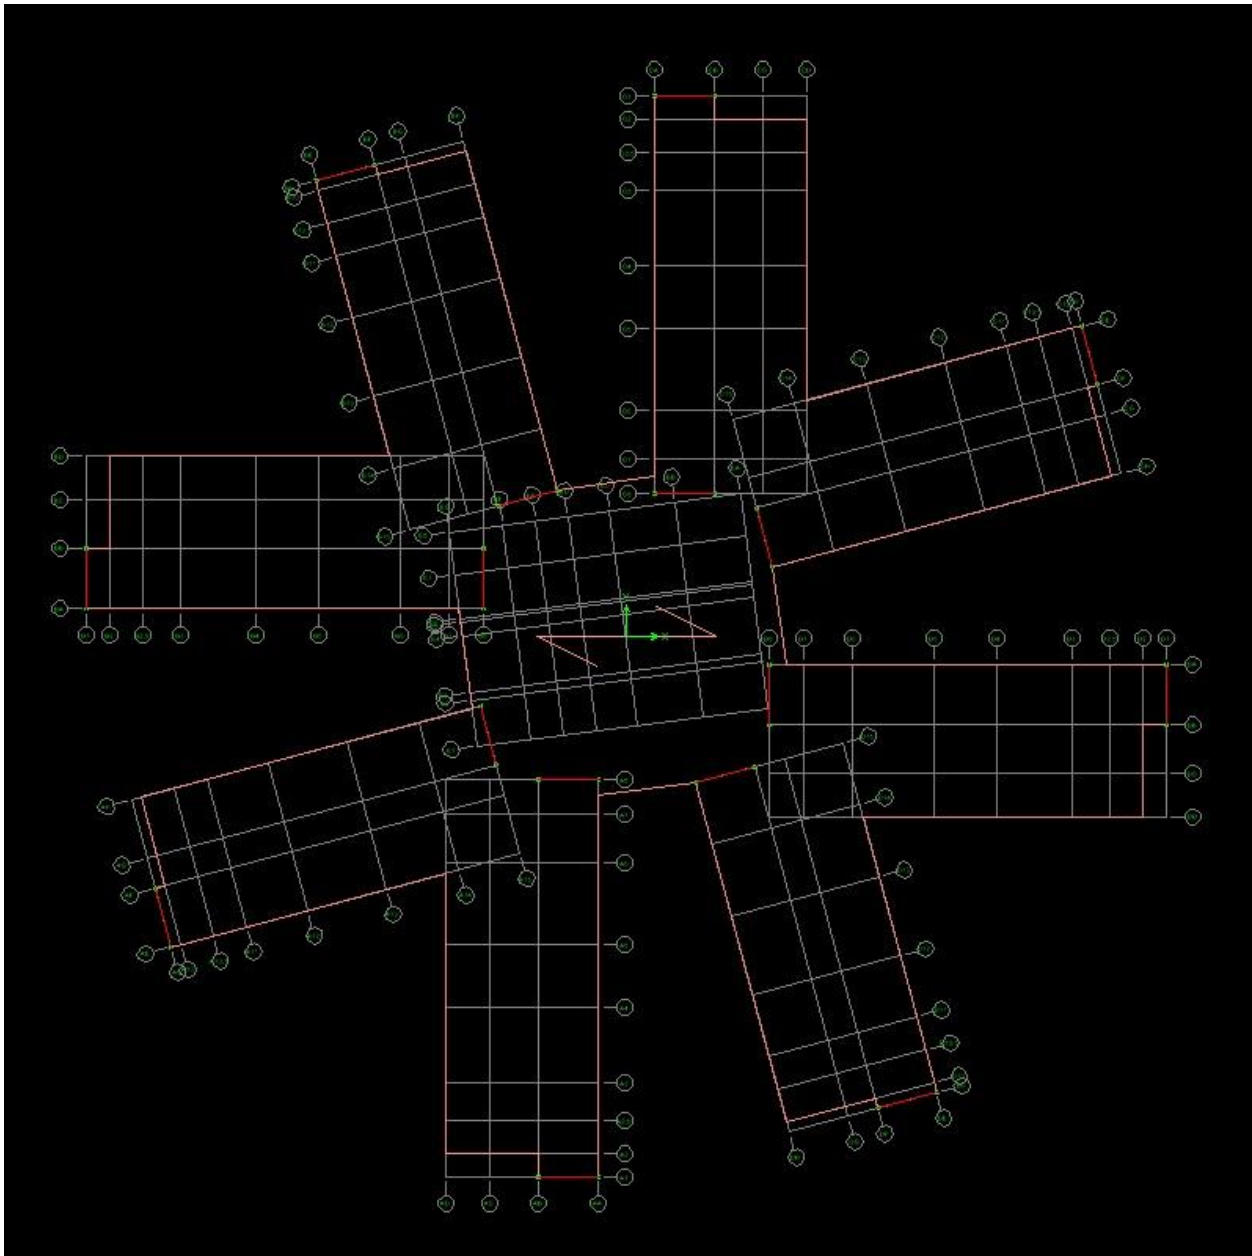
The plan layout above shows the separate local grids used to model each wing at the specific angle and location necessary to replicate the model adequately.
